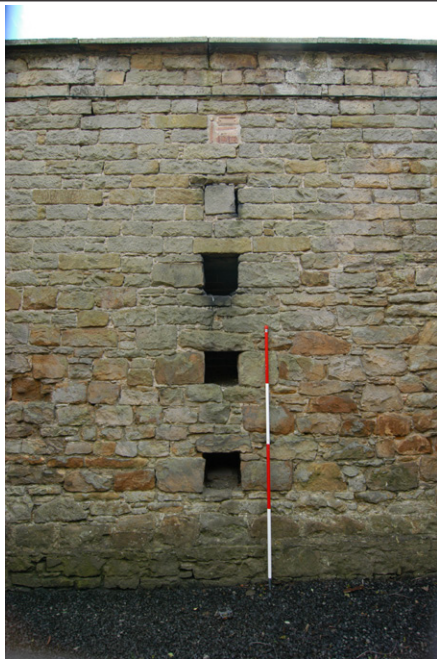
Exterior NW-facing elevation, vertical row of hatch vents
